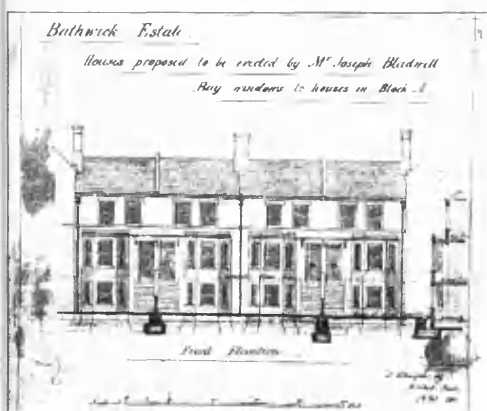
J. E. Gill's drawing dated 7 October 1871. Proposed houses Block A. Building Control Plan.
